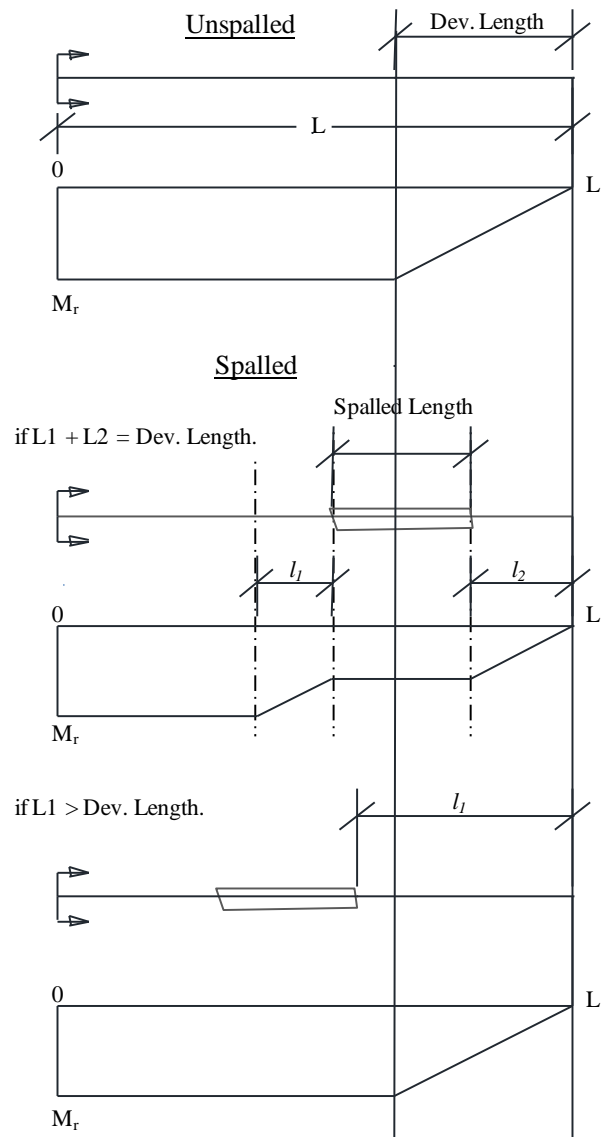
Moment resistance of unspalled and spalled bars.
